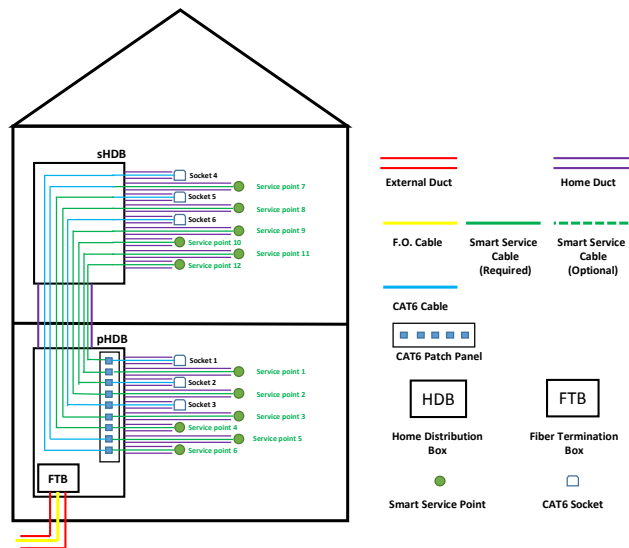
Example 2: Single Dwelling (Two Floor Villa) Building
